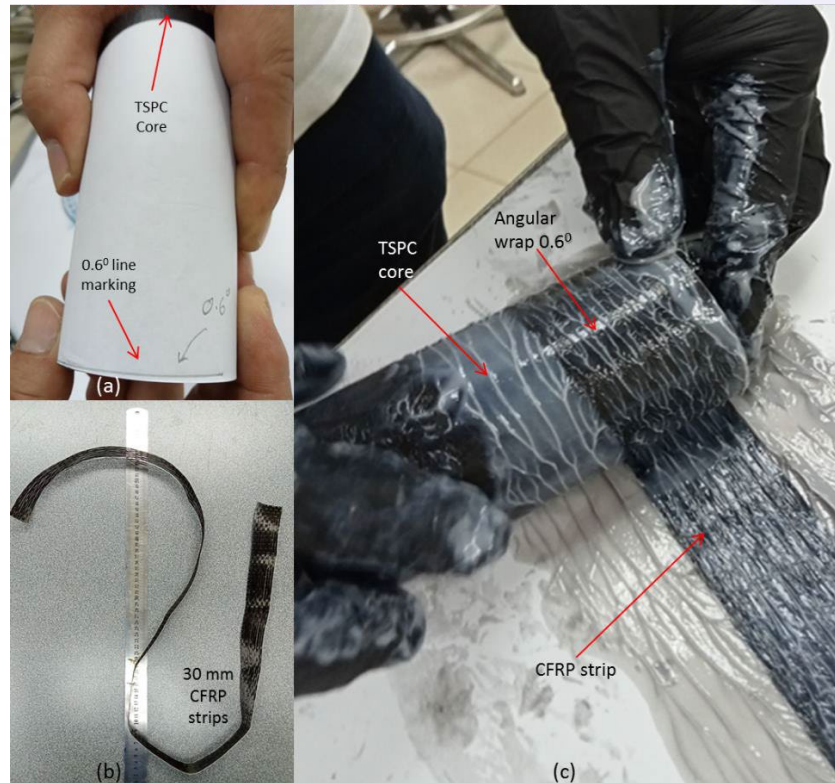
(a) Marking of 0.6° angle line on TSPC column specimen. (b) 30 mm and 1250 mm in length of CFRP strip to wrap the TSPC column. (c) Wrapping process of CFRP strip onto TSPC column using epoxy Sikadur 330.
